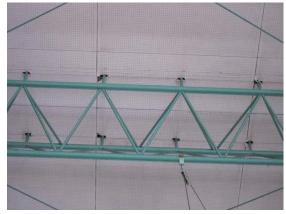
Damage to metal furring suspended ceiling at the connection
